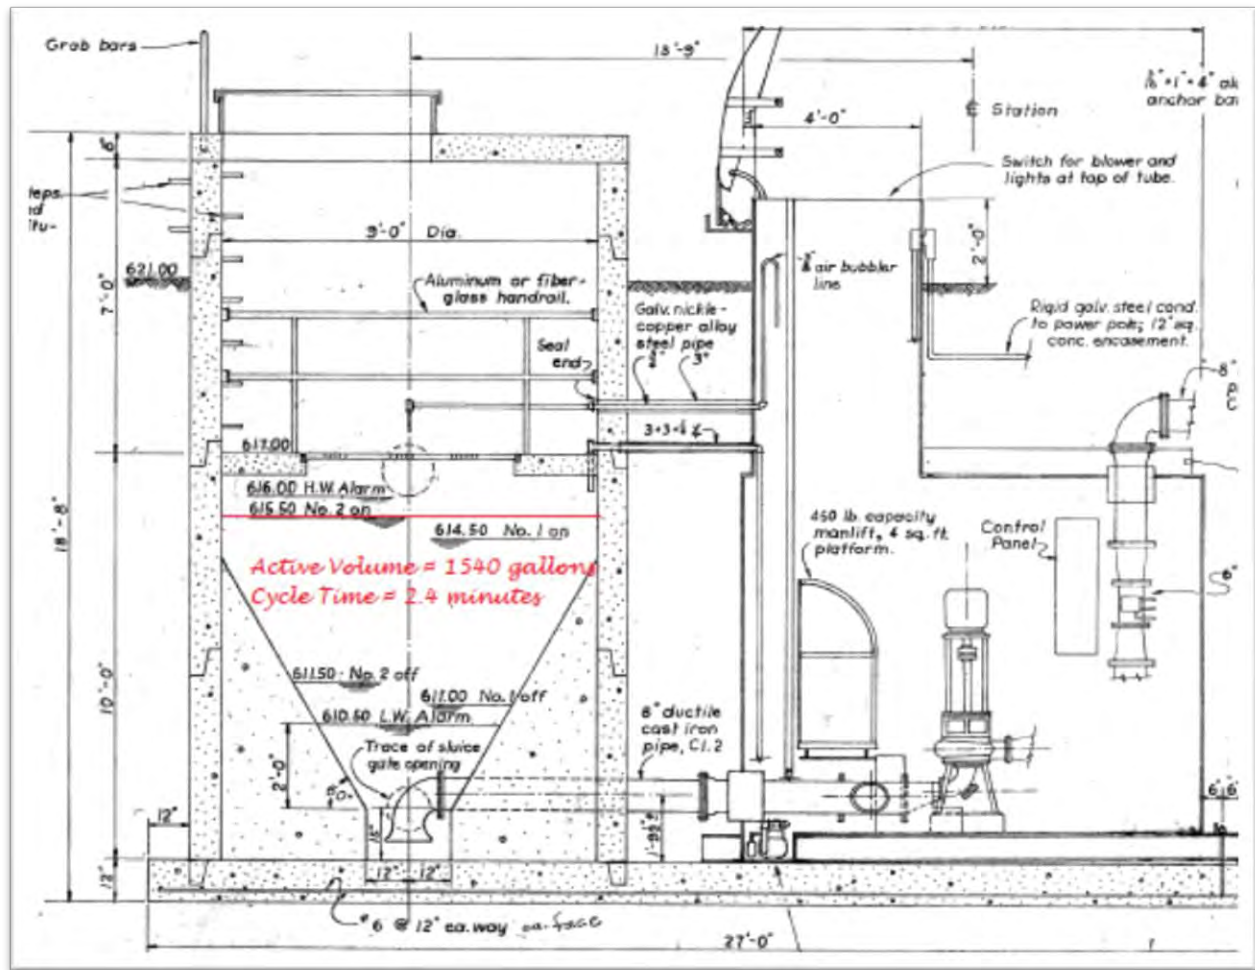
Willowbend Pump Station Construction Drawings, Wood County Sanitary Engineer, 1975
